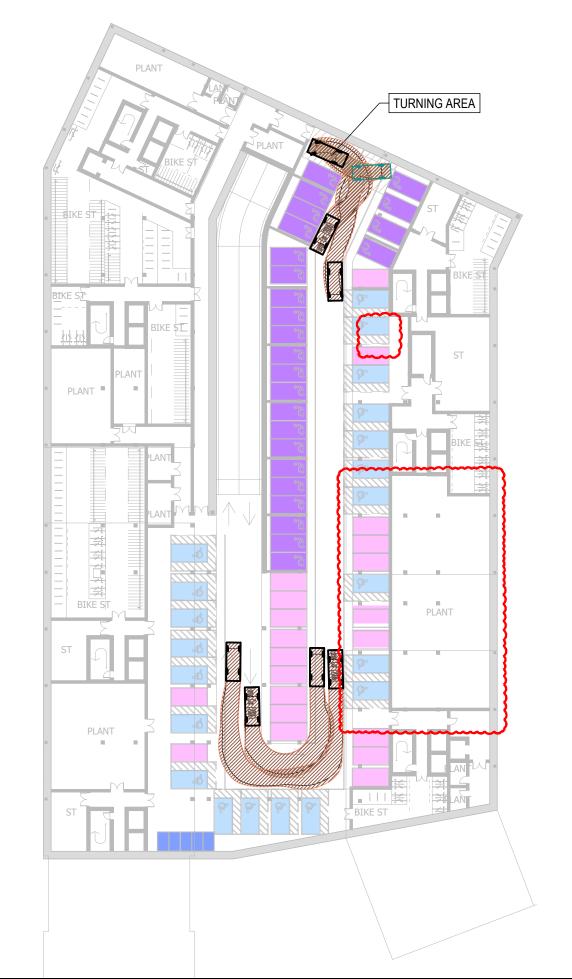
/5520/15DDrawing Number: 38262/5520/16D
